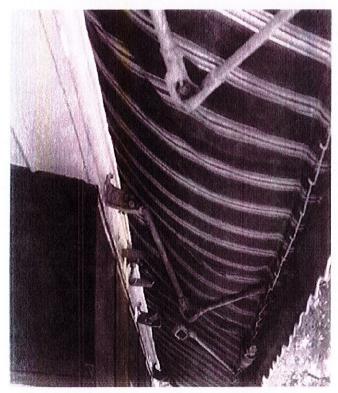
Laterabarm awnings were preferred on long elevations, especially those with sixel glass (where vertical arms could not be fastened to the building facade). When lateral arm awnings were installed across a broad storefront or parch, manufacturers recommended spacing the arms at approximately eight foot intervals.
